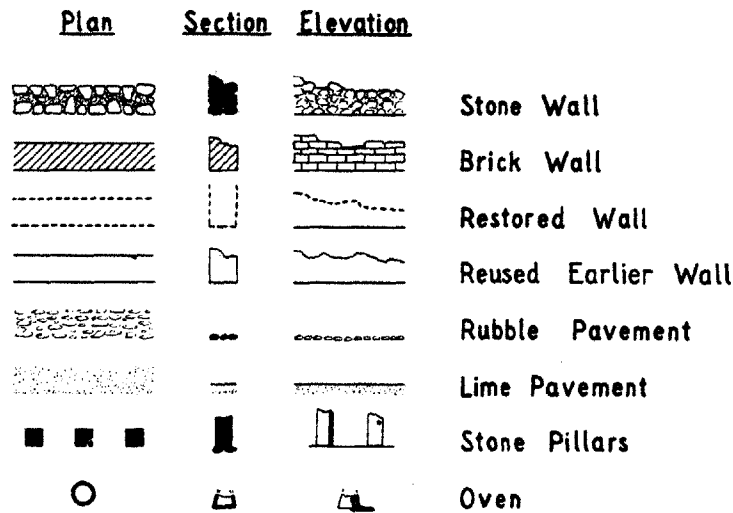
KEY TO CONVENTIONS USED ON PLANS AND SECTIONS
